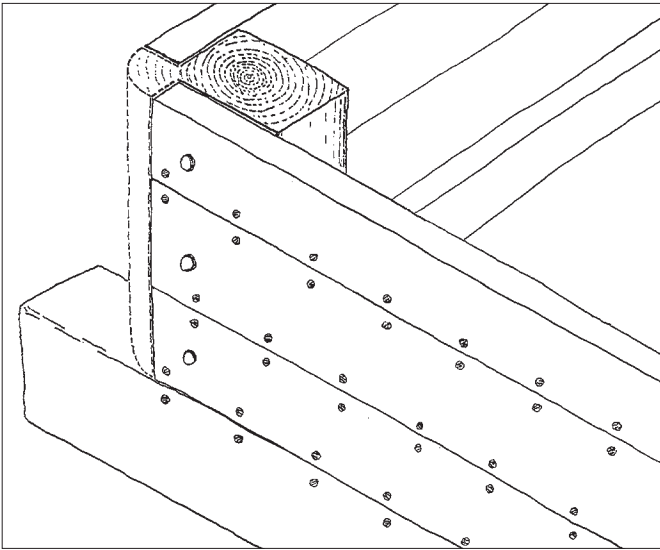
Detail of an external corner stanchion with side wall planking let into it, Area K caisson, Caesarea (C. J. Brandon).
